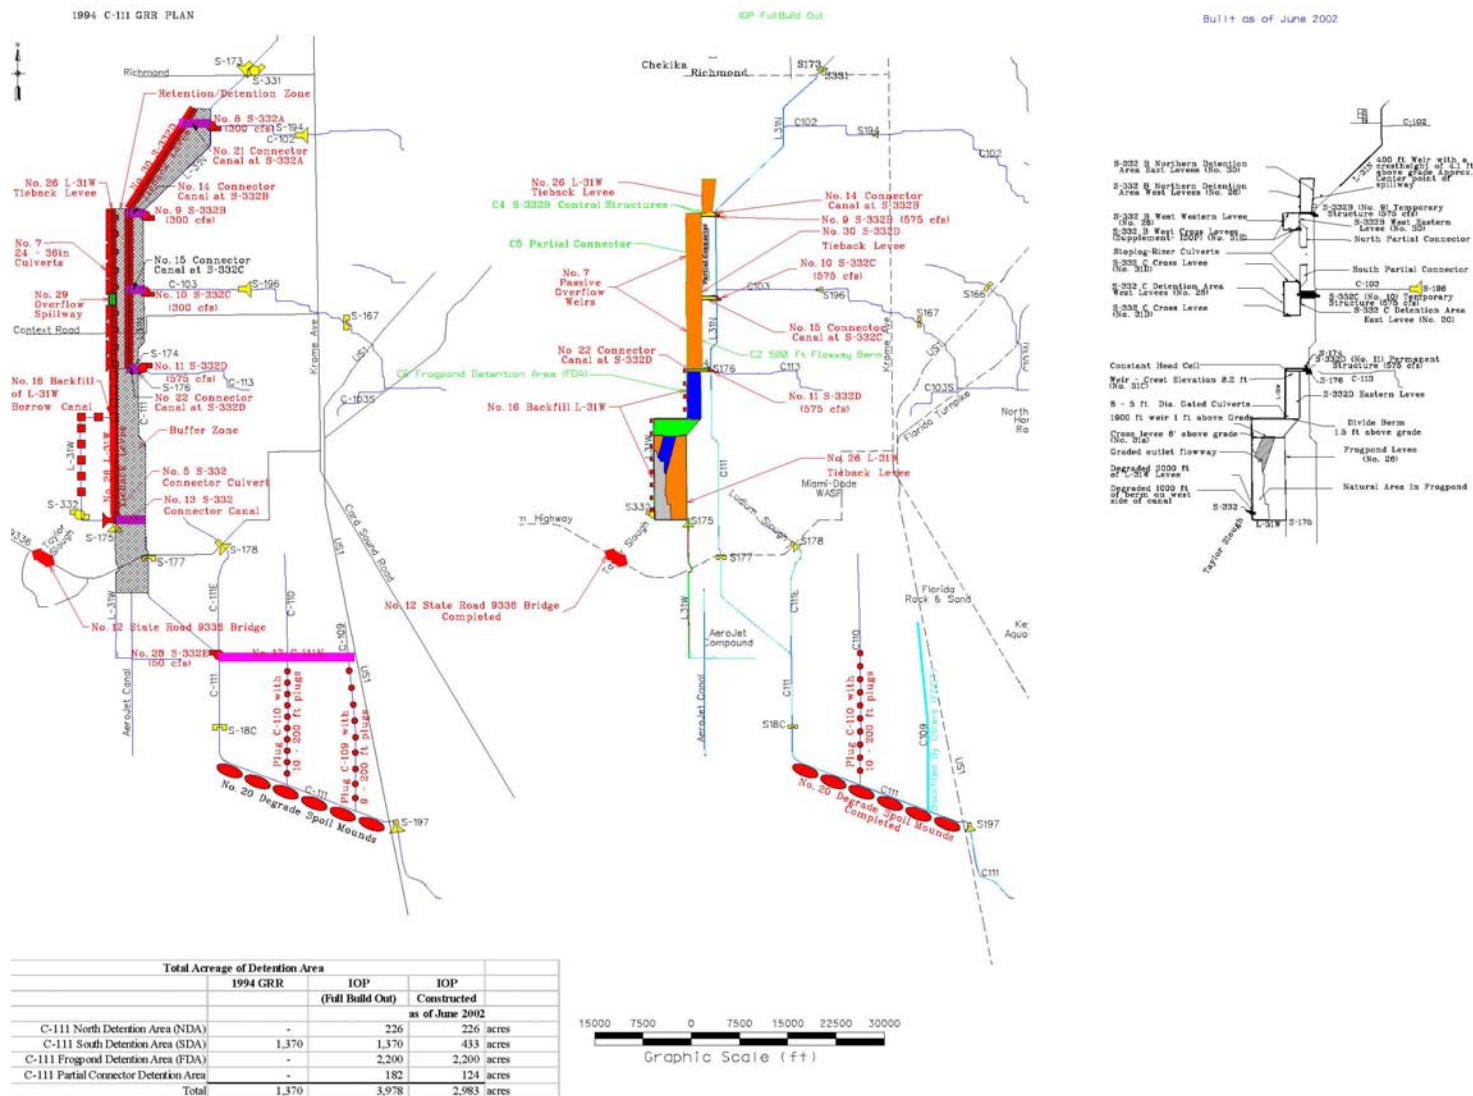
C-111 Proposed, Current As-built, and Future Conditions with Full Buildout
